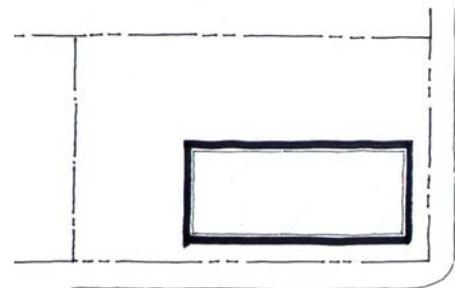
Street frontages shall be occupied by building facades for at least 60% of the lot width on the buildings primary street. Corner buildings may reduce this to as much as 50% on the buildings secondary street provided the cumulative total for both streets exceed 60%.
